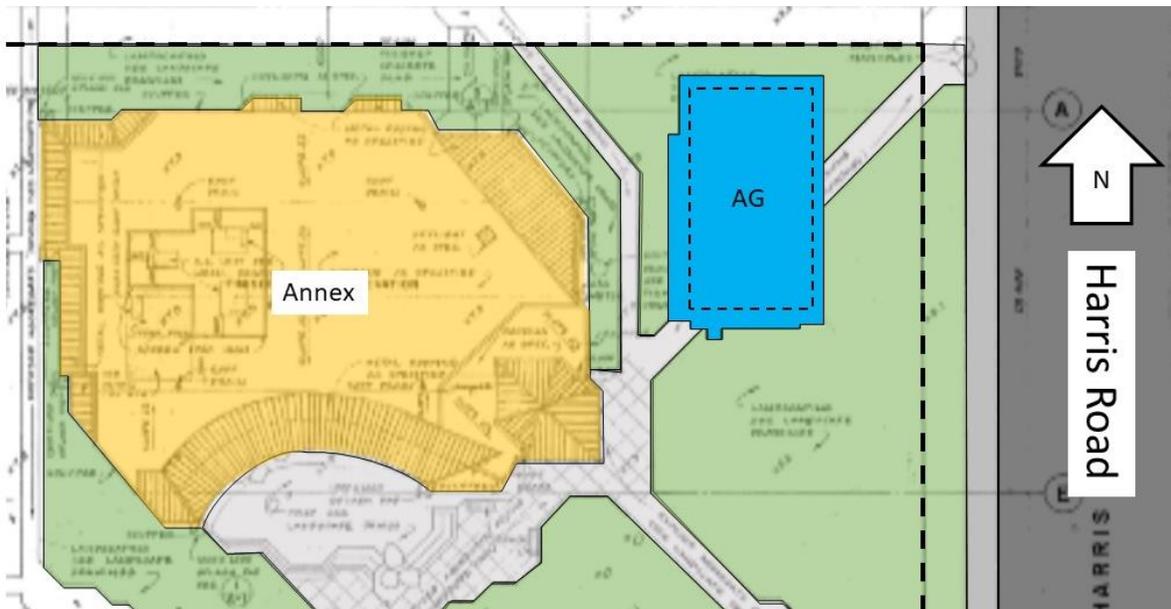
Approximate Site Location of the Art Gallery Structure Adjacent to the Annex Building
